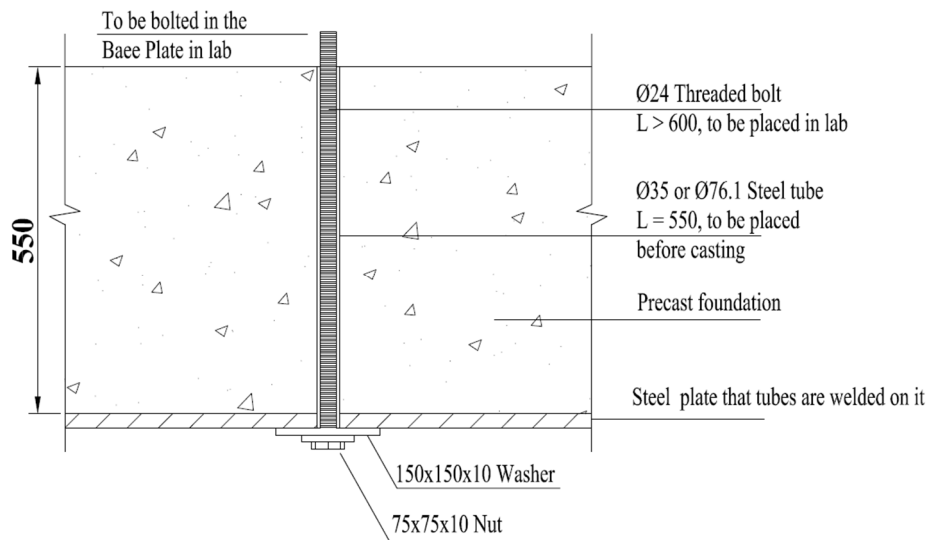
Connection between the anchor rod and bottom of the concrete foundation
